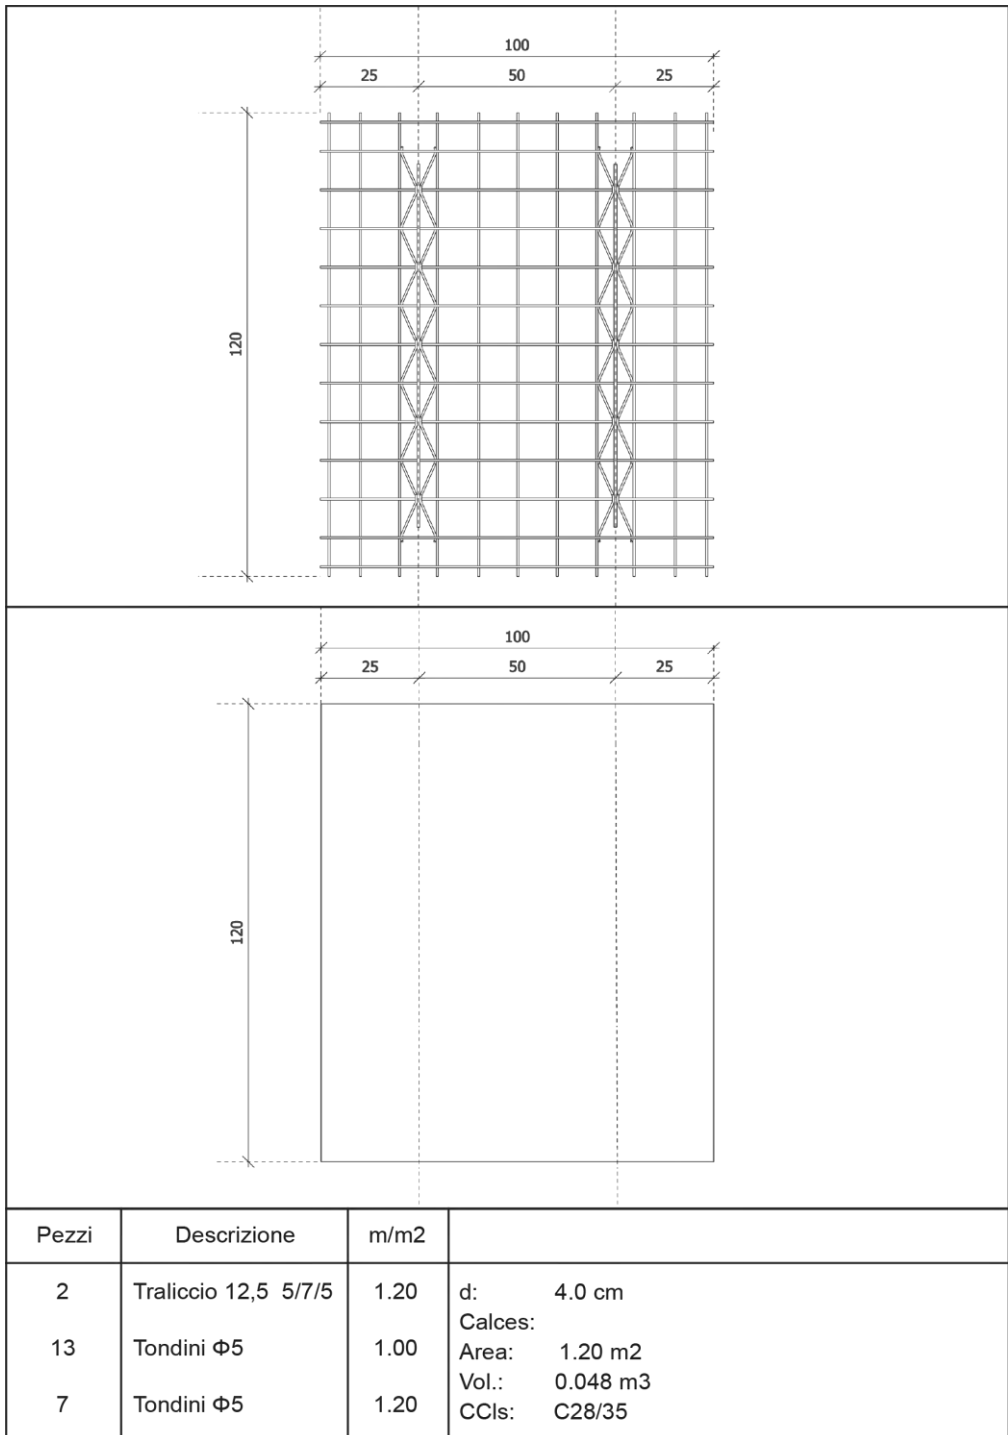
Production sheet for the B assembly. Source: Author
